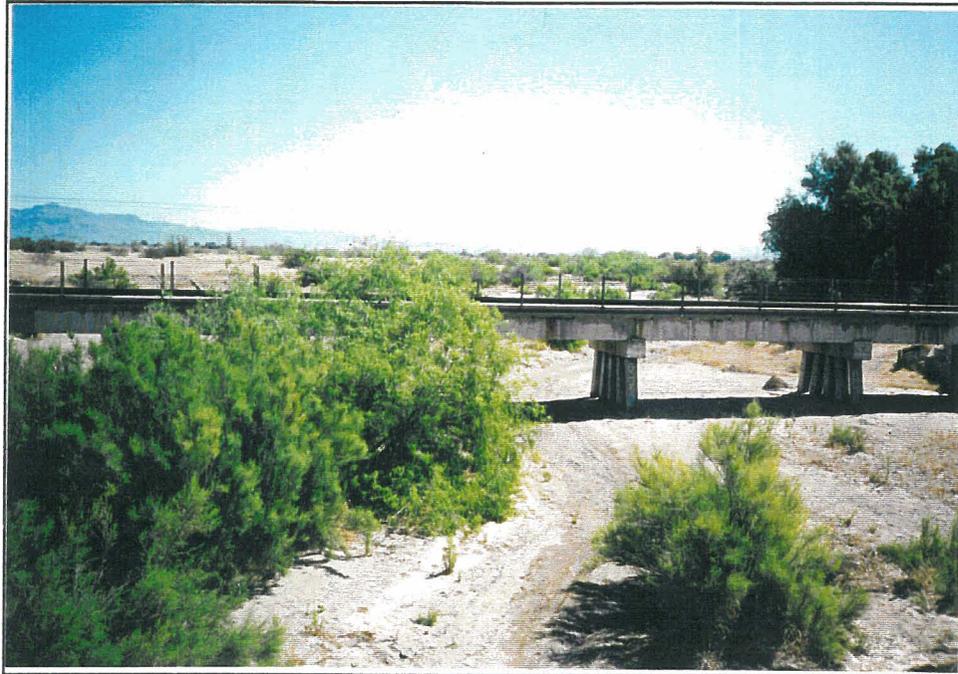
View looking upstream from bridge deck toward SPRR bridge. Note upstream right overbank is grassed with occasional small trees and brush. Also note mature vegetation formed on middle bar between the two structures.
